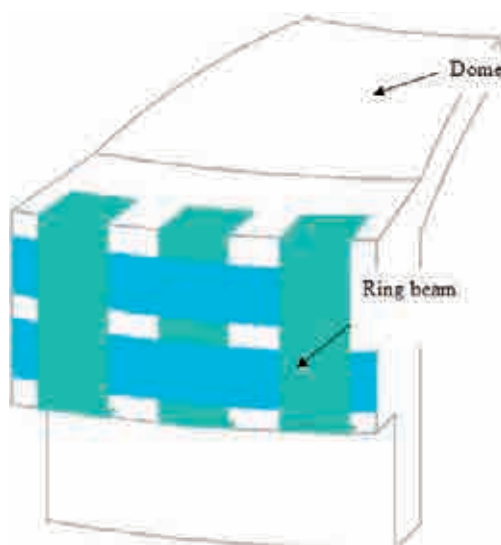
Application pattern of glass fibre reinforced polymer sheets to the ring beam.
